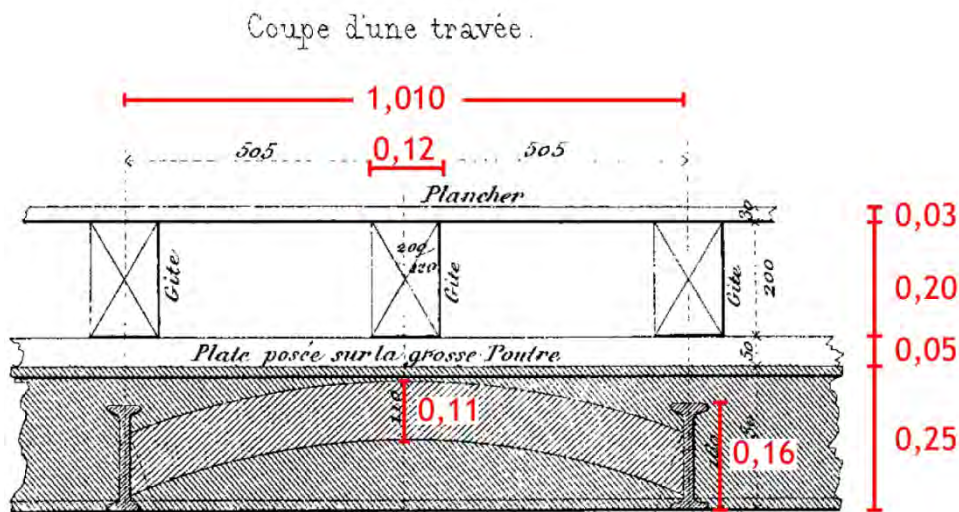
Detail of the layers in the barrack. *Atlas de la Société de l'Industrie Minérale*, 1870 – 1871, planche VIII.
